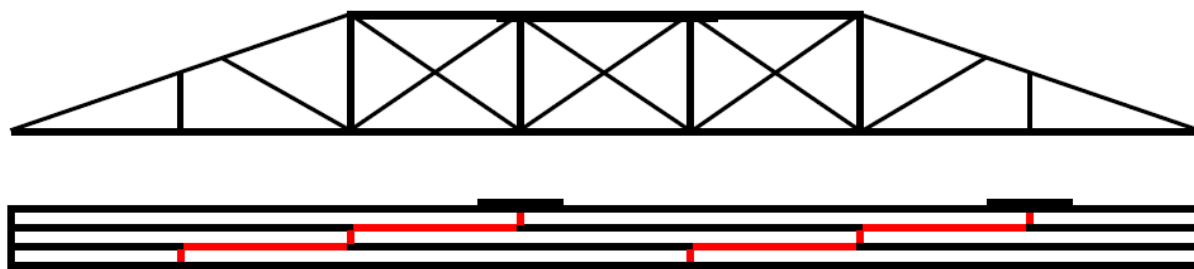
Layout of Laminates and Possible Failure Planes in Old PWD Timber Bottom Chord
